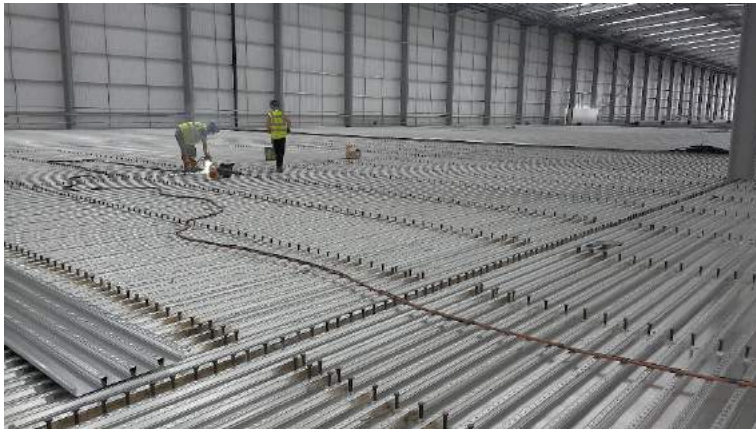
Metal Decking towards the end of the Stud Welding process.
